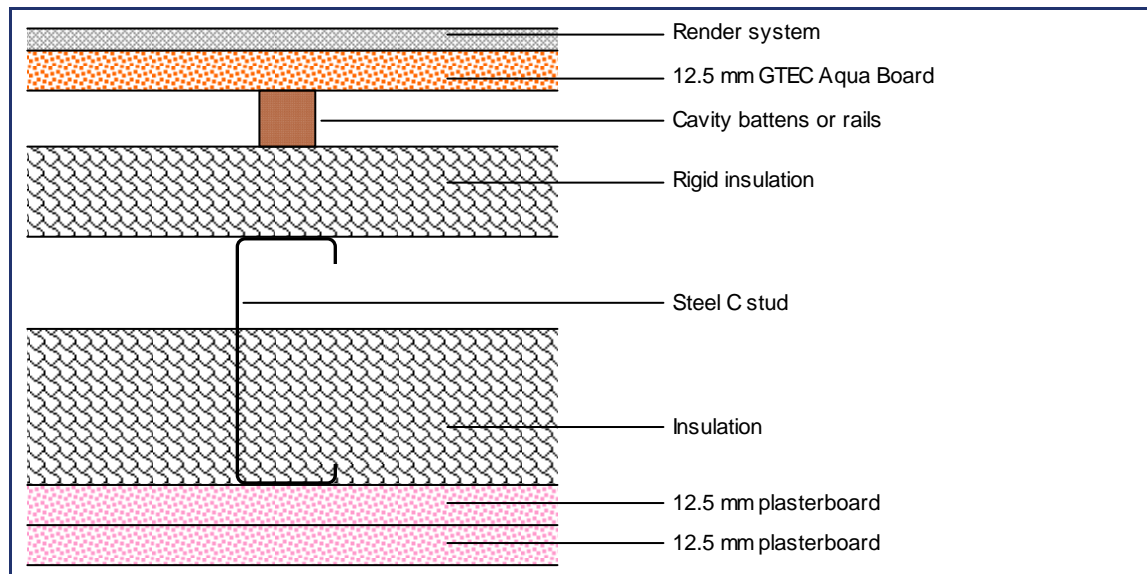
Aqua Board used as external sheathing board with EIFS with cavity
